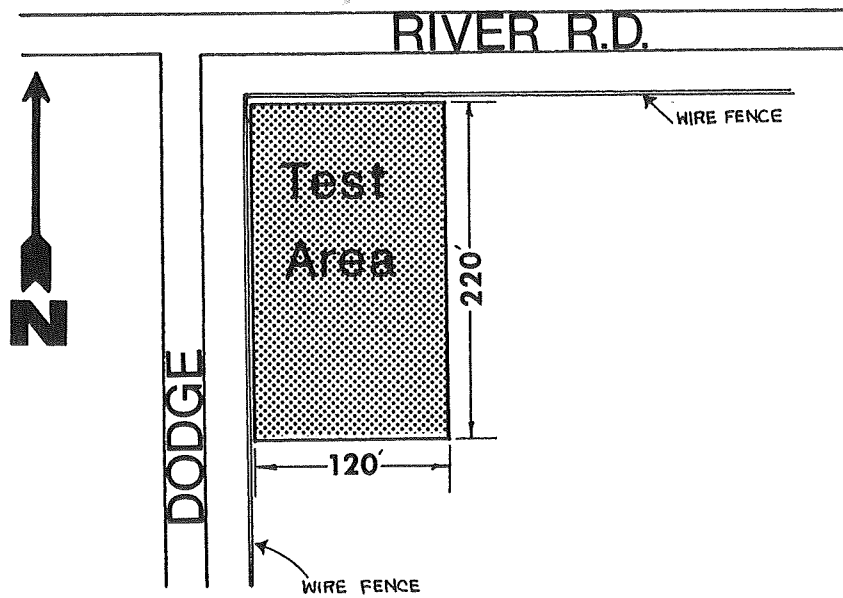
GENERAL SITE PLAN, AES FARM SITE
